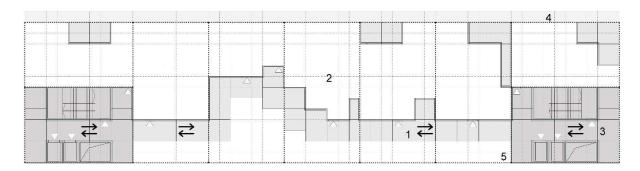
Accessibility diagram. 1 – Complementary components, 2 – Apartment arrangements, 3 – Vertical accessibility cores, 4 – Façade position, 5 - Outline of maximal extension of the apartment.
